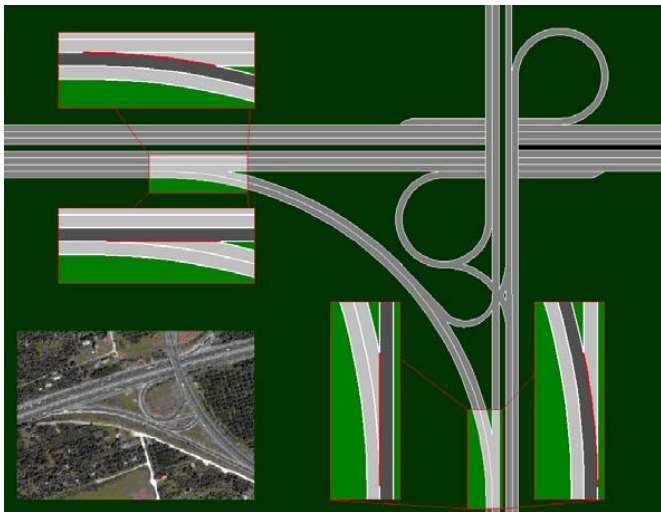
Junction of Stage common of M1-M7 and Egér Road [2]
